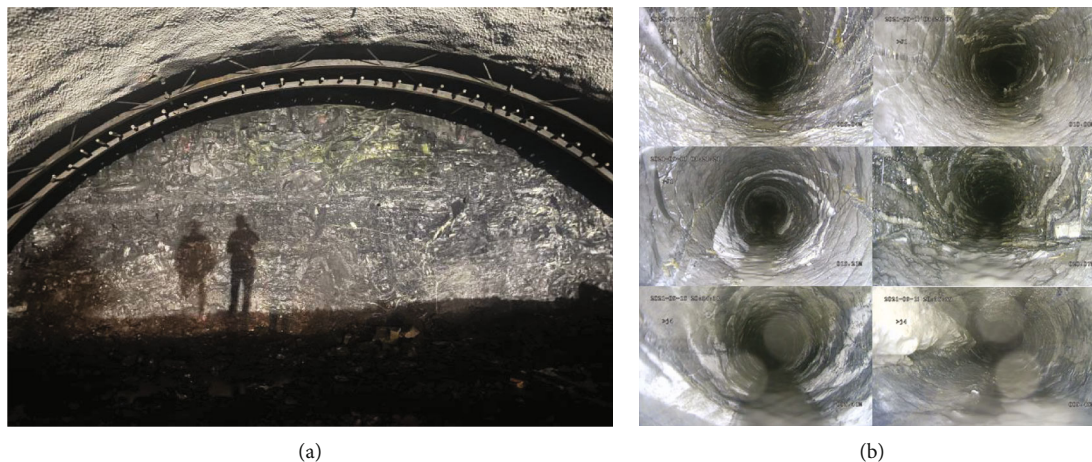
Grouting effect: (a) palm surface after grouting and (b) in-hole imaging of the inspection hole after grouting.
